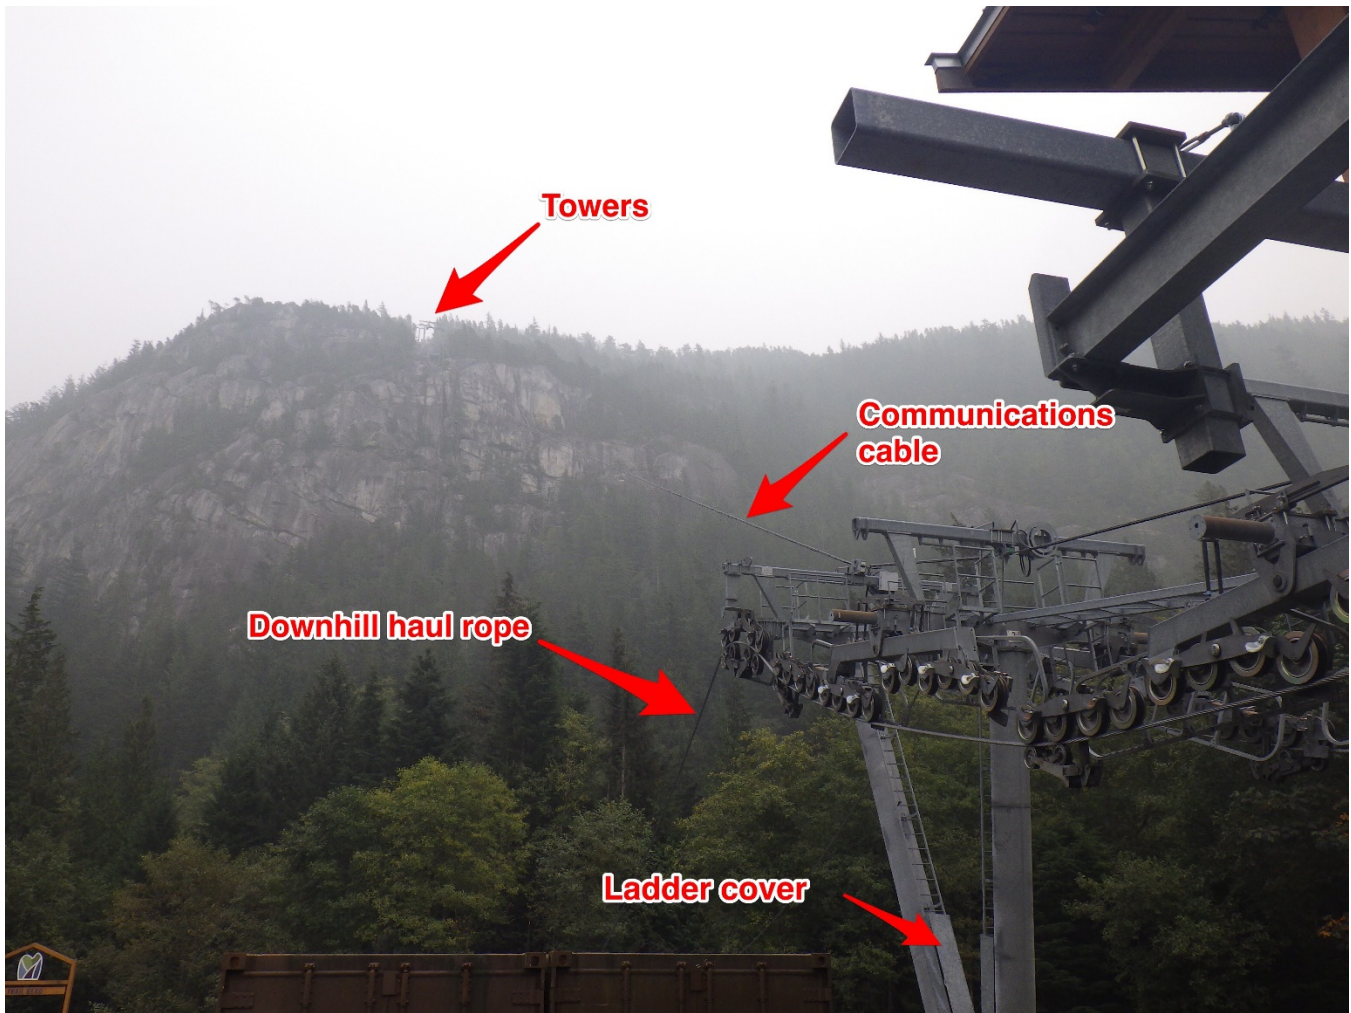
View from the last tower at the base terminal looking up to the towers after the first large span.
